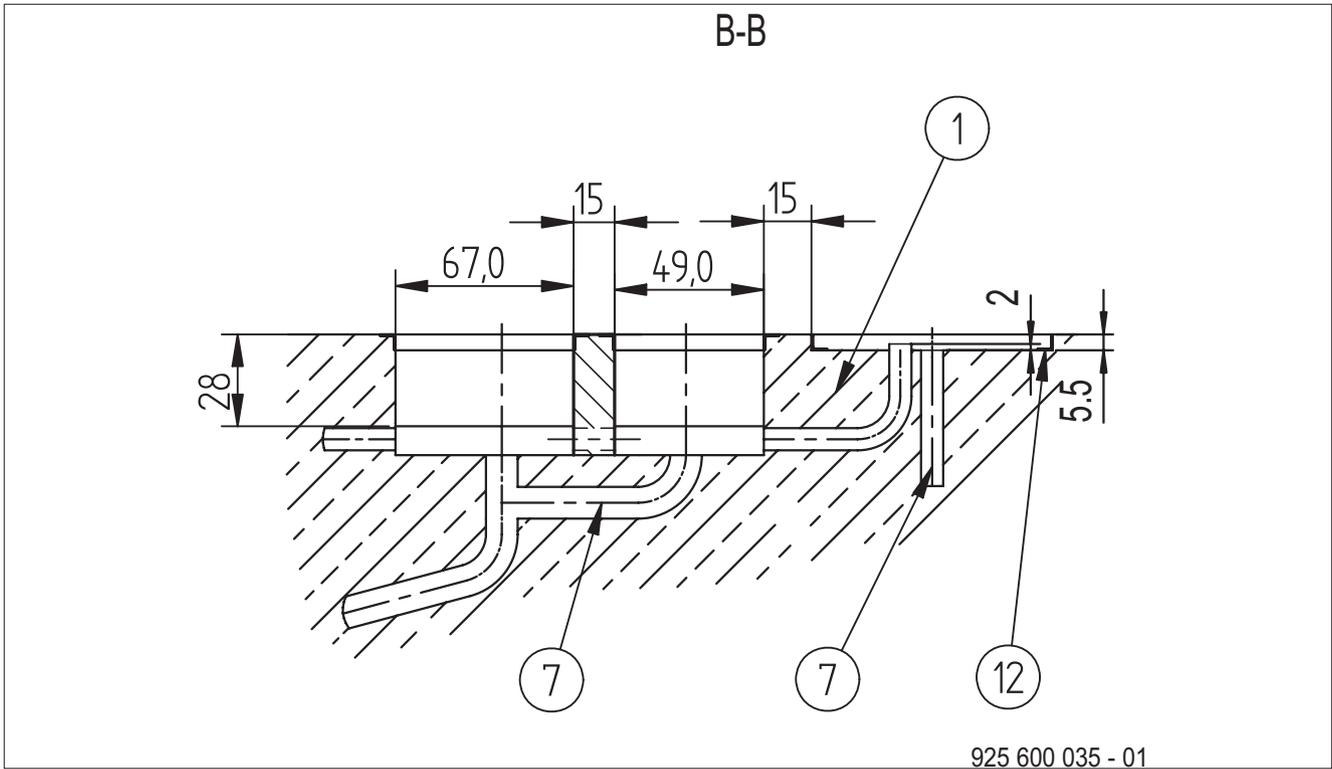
Plan of Pit BD 660 with PC, suspension tester and side slip tester - Sectional view B-B
